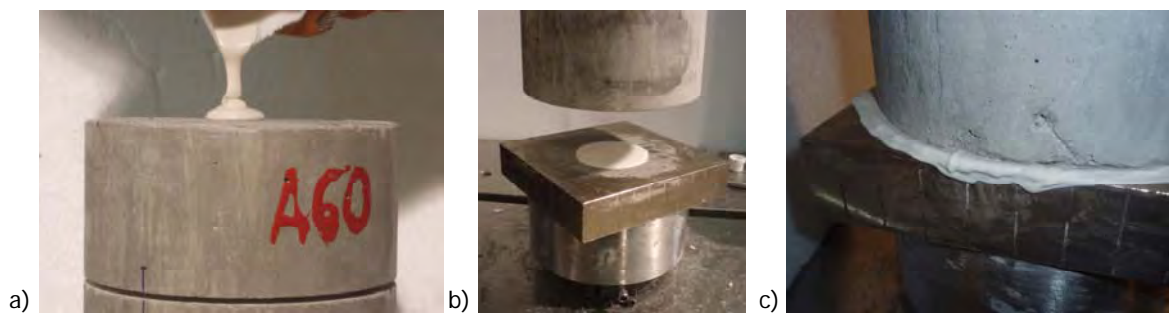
Fixing the specimen to the testing machine: a) Placement of the adhesive in the top surface; b) Aspect of the glue when fixing the lower steel plate; c) Detail of the specimen after glue's hardening.
